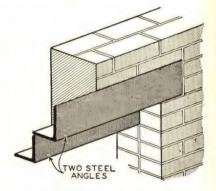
Steel Angles Forming Lintel for Casement Window in Eight-Inch Brick Wall
